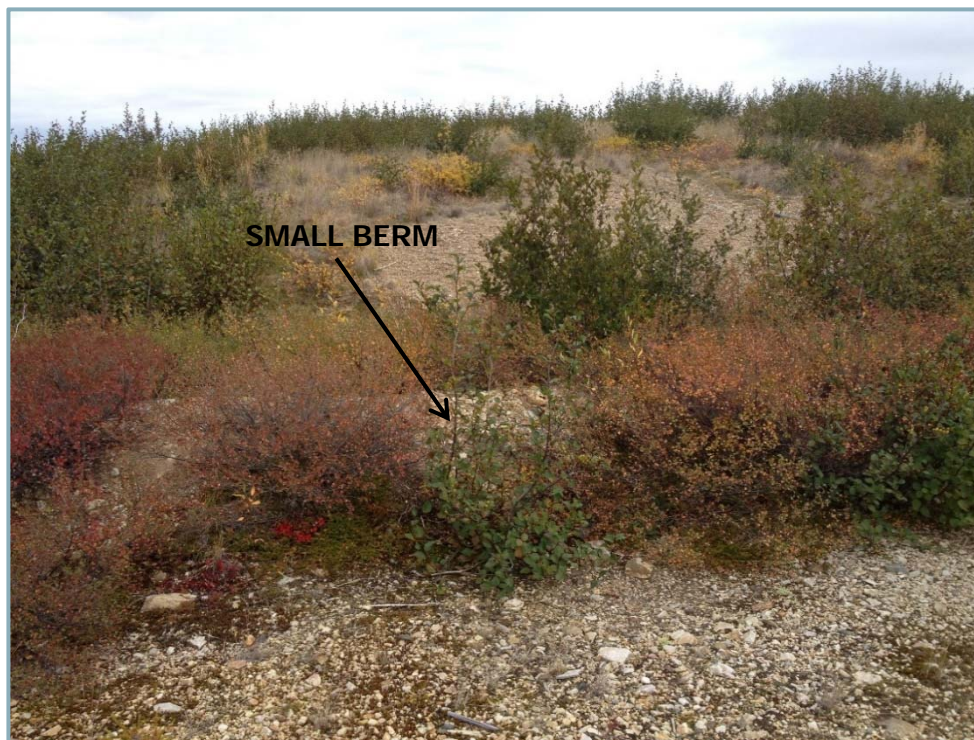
North side of Shear Lake Waste Rock Pile with berm and grasses (looking south).
